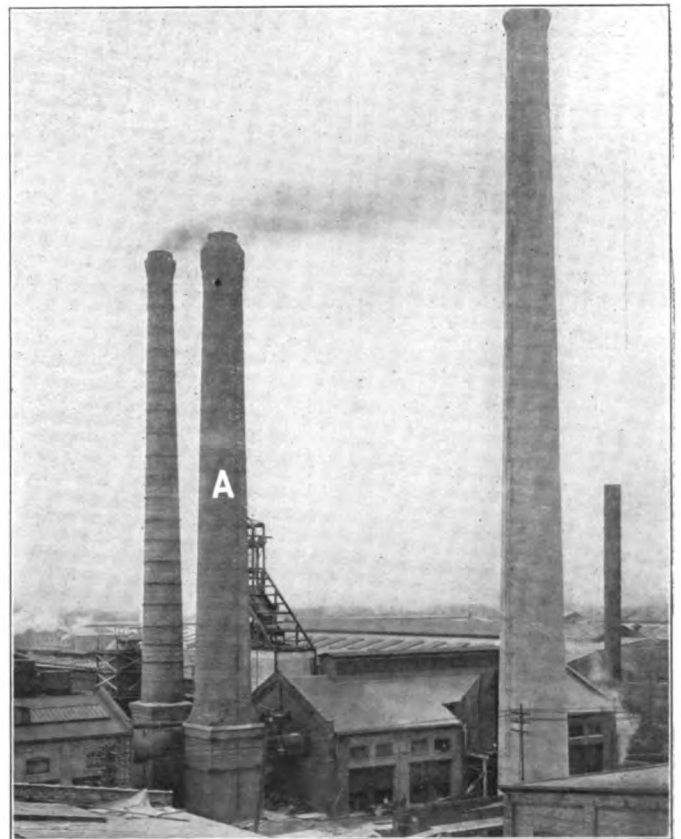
Boiler House, Showing New Concrete Chimney.
